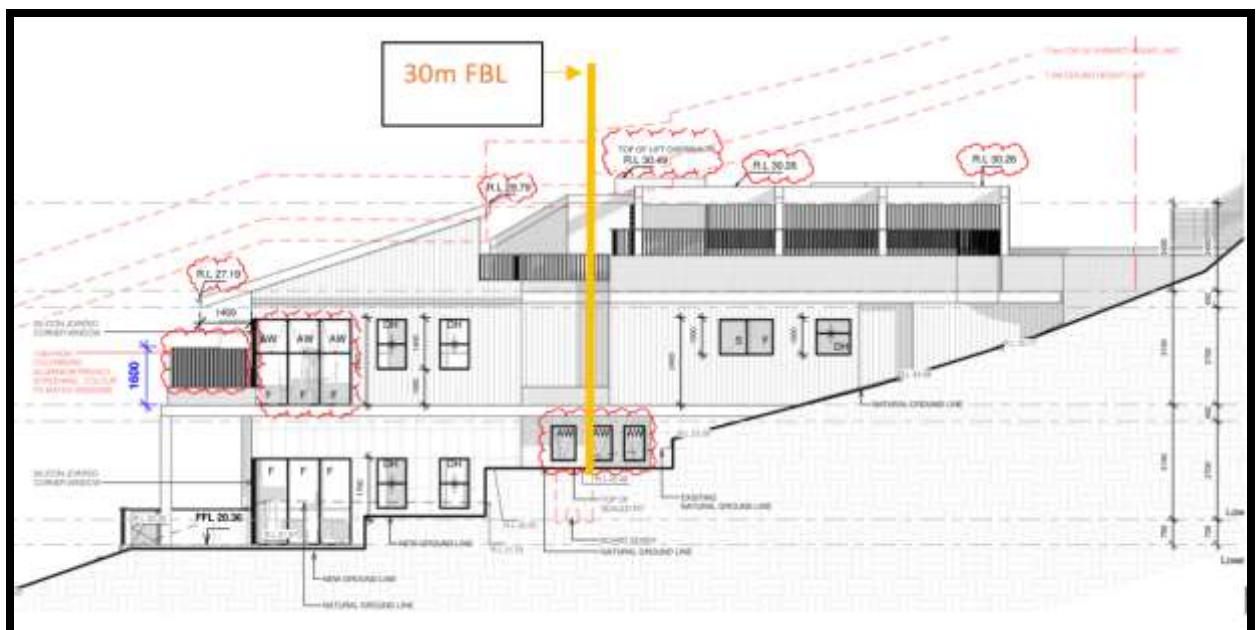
East Elevation showing the extent of the encroachment beyond the 30m FBL
